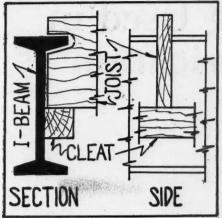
Wood Joists Resting on Wood Cleat Bolted to Web of Steel Beam.
